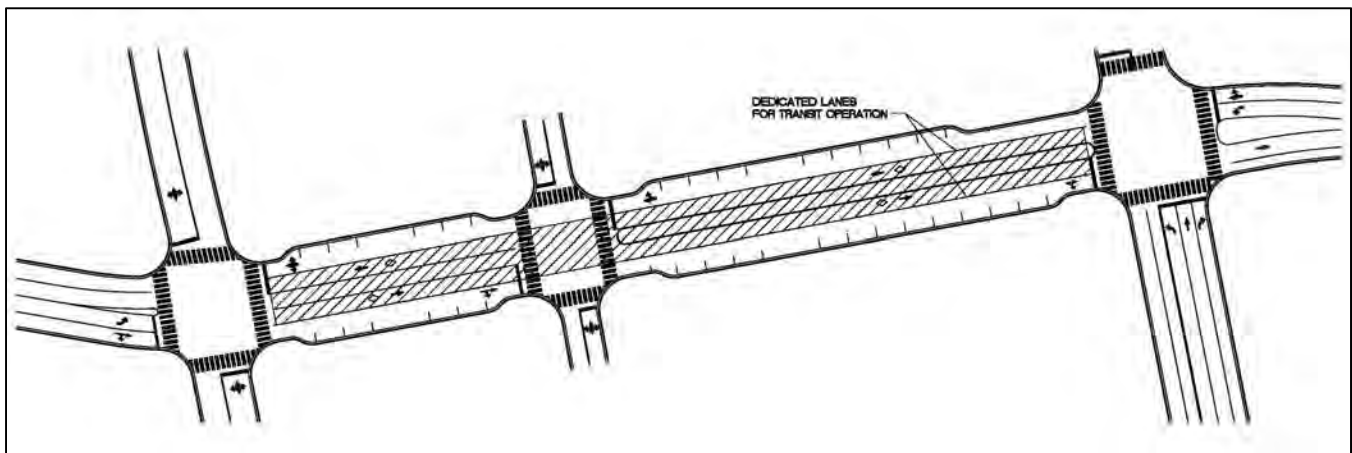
Proposed 12th Street South Lane Configuration With Streetcar [Source: Arlington County]
